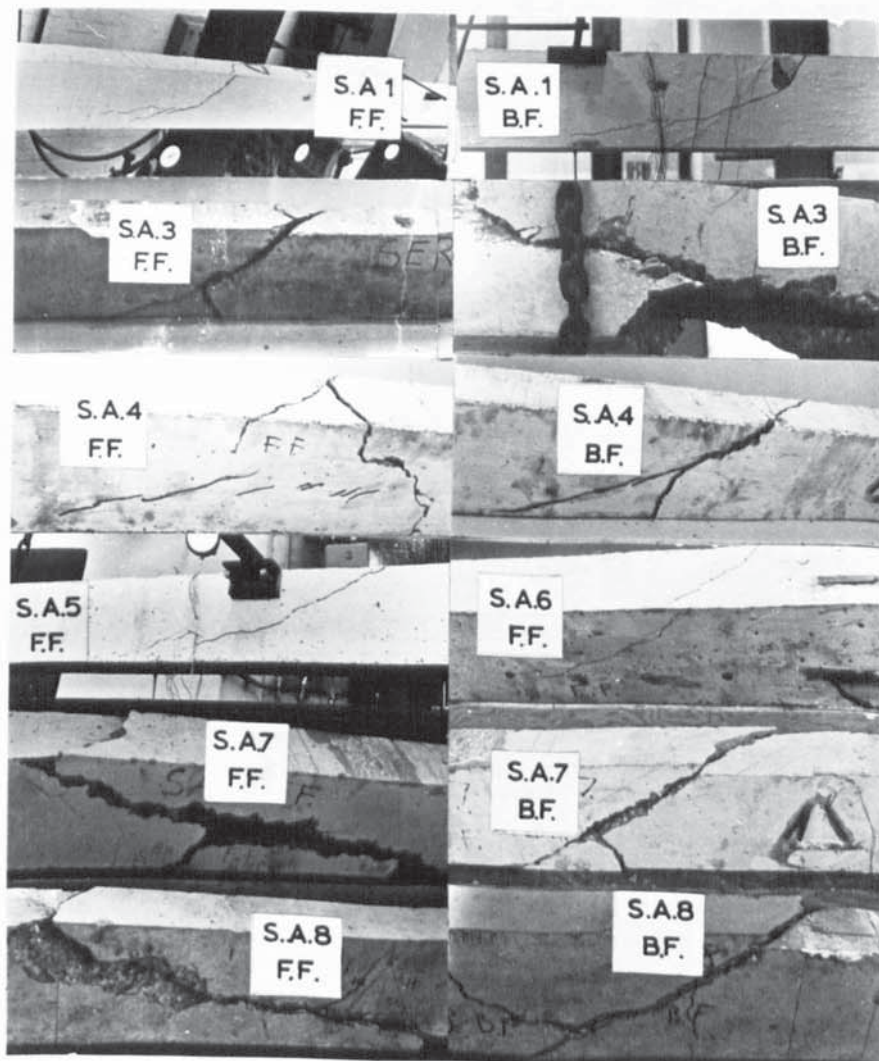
Typical failure patterns of prestressed beams
